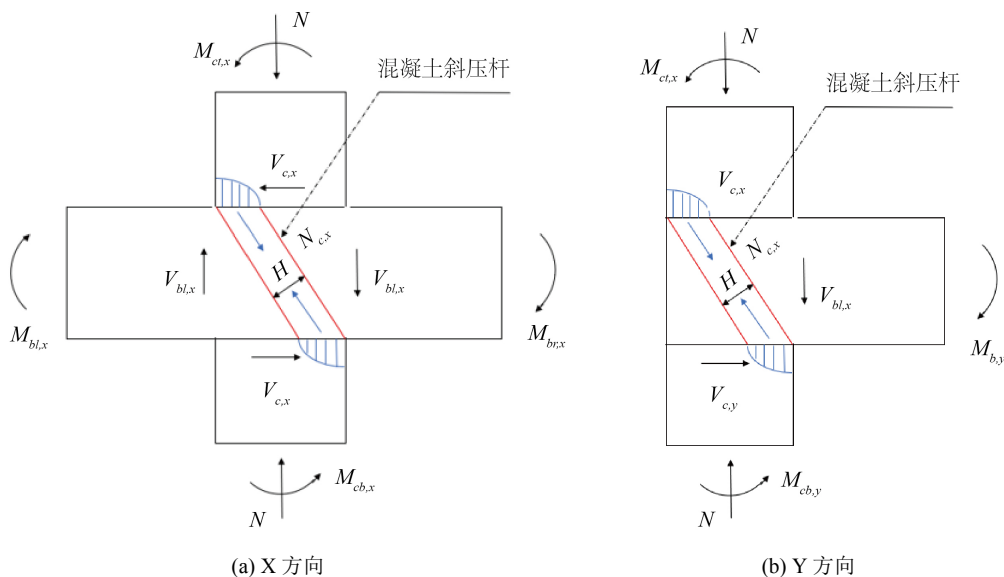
Mechanical model of concrete compressive strut in X-Y plane of spatial exterior joint core
